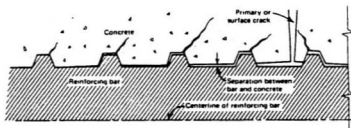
Section through reinforcing bar and concrete, showing separation that occurs near a primary crack
